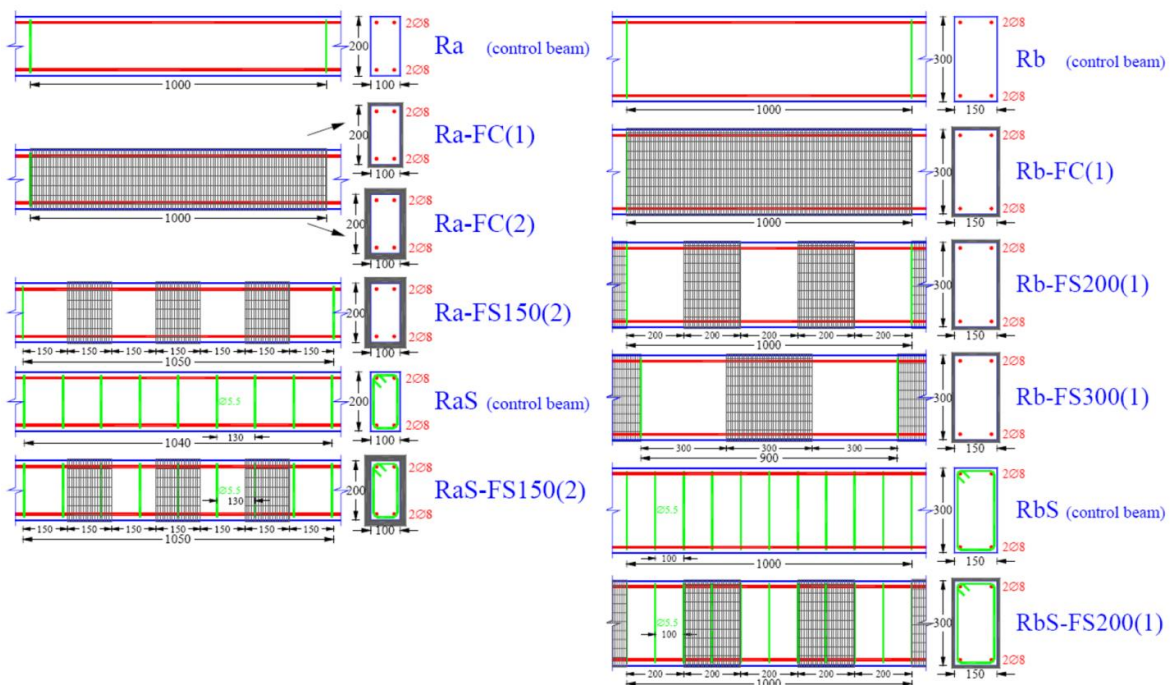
Geometry and reinforcement arrangement of the tested beams, Chalioris (2007)
